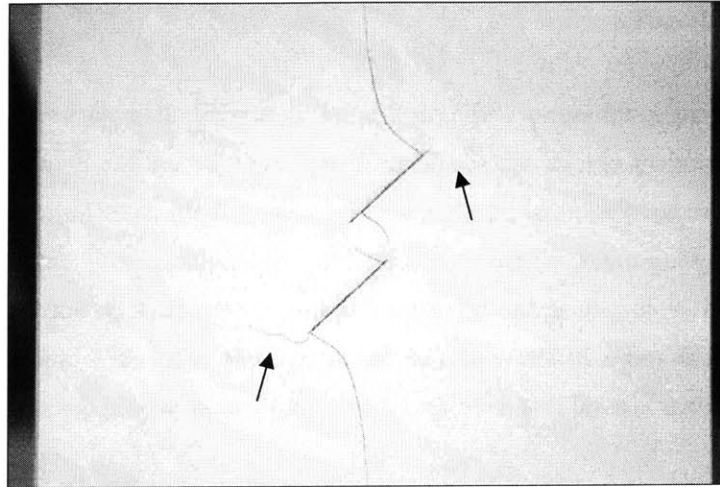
An example of horizontal secondary cracks in the 45-a-0 geometry.
